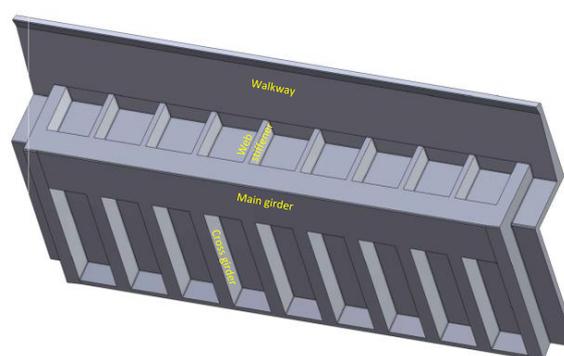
A prefabricated element in 3D of the bridge deck (extracted from the drawing made by the precasting contractor Element Ltd).
